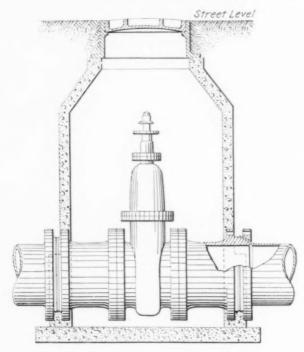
VALVE BOX WITH VALVE IN PLACE
